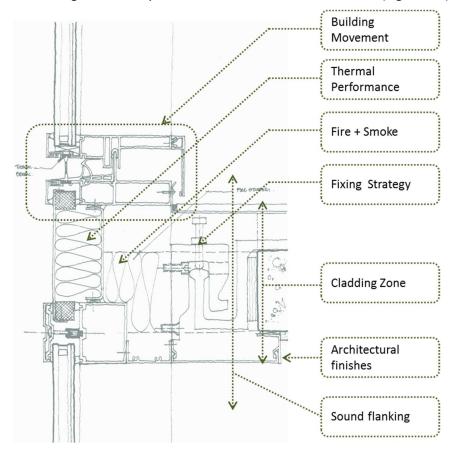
SECTION THROUGH A CURTAIN WALL TRANSOM WHERE IT IS CONNECTED AT THE STRUCTURAL SLAB. (MULLION SKETCH COURTESY OF MATT WILLIAMS, ARUP FACADES)
